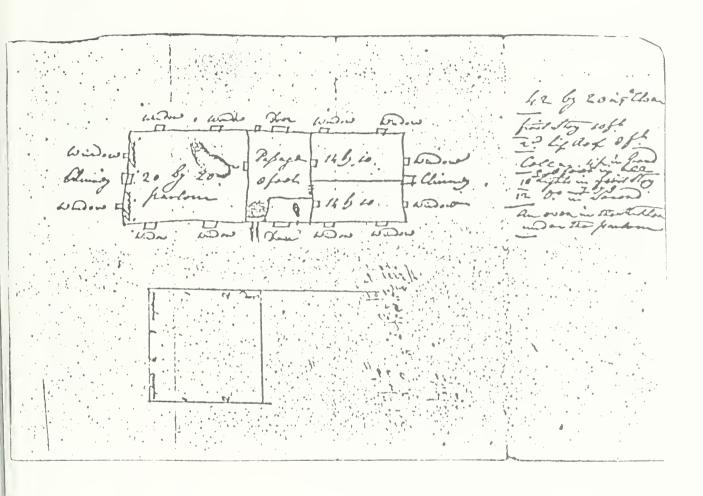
Rough drawing of early floor plan, possibly of Schuyler House.
